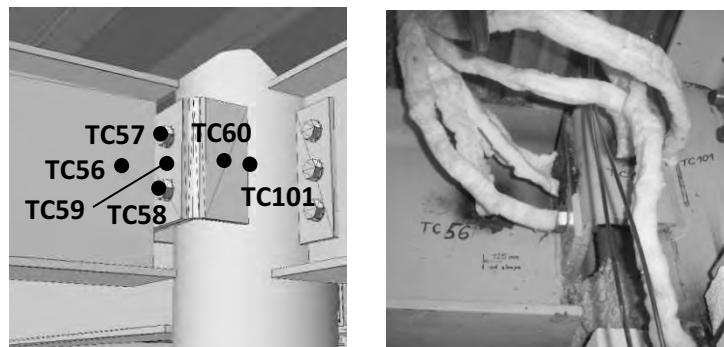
Fire unprotected beam-to-column connection (A2-B2 to B2) in the 1<sup>st</sup> floor
